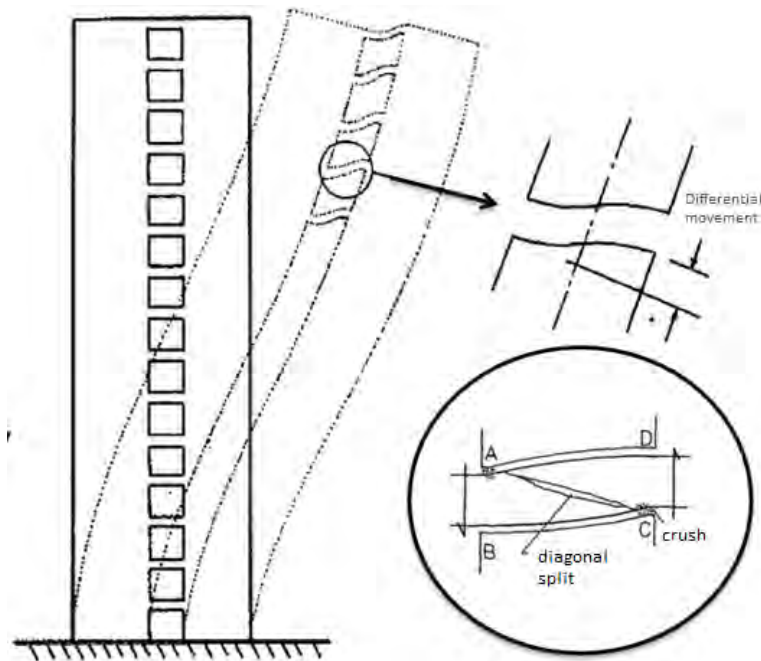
Deformed shape of a coupled shear wall subjected to lateral load (Subedi, 1991)
